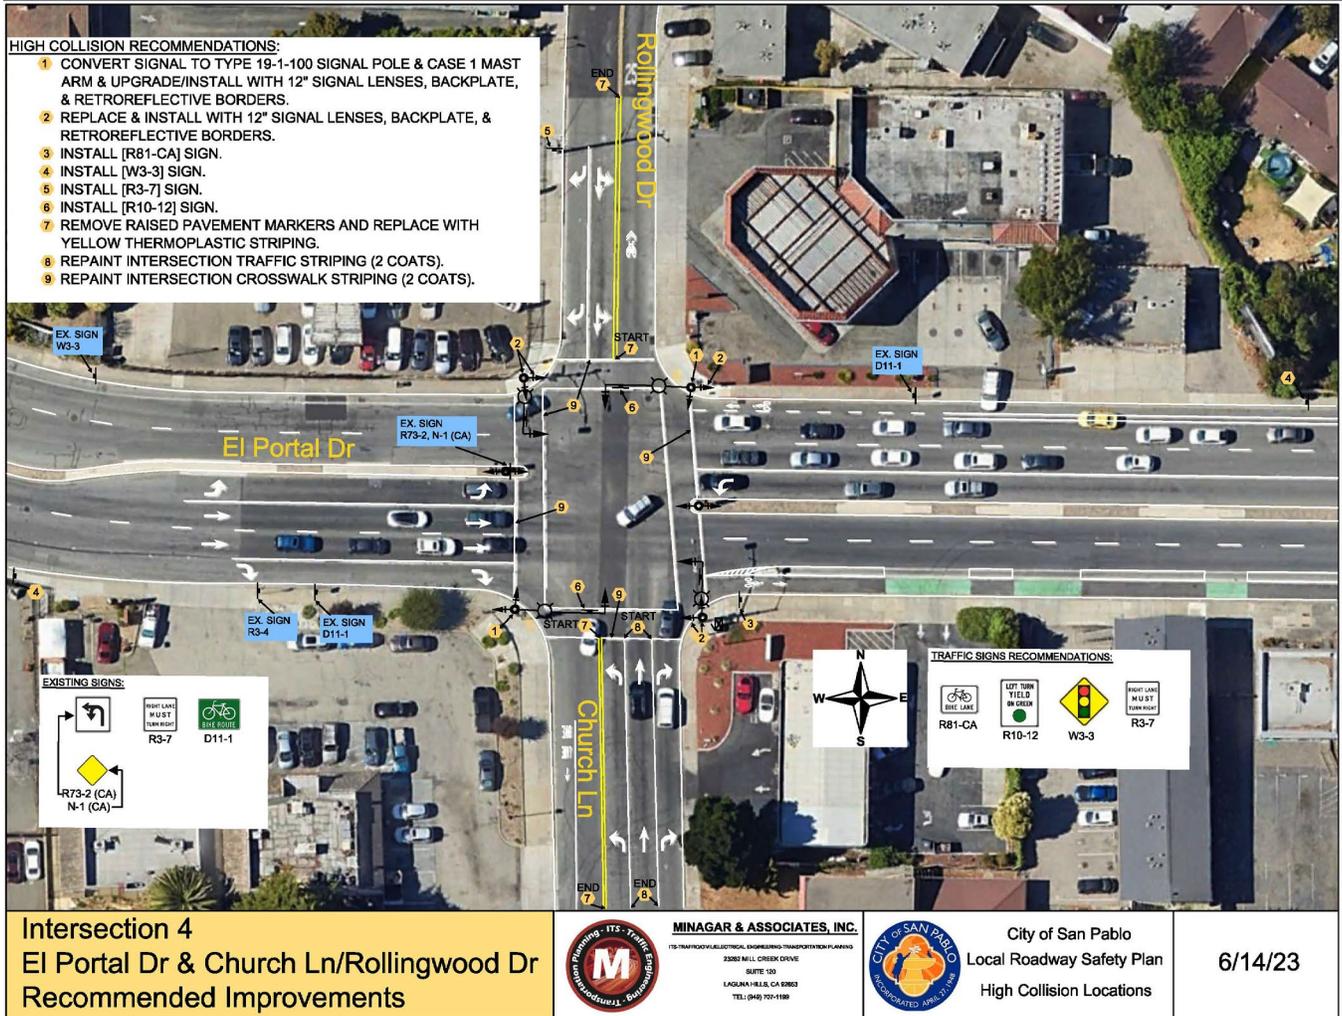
Intersection 4- El Portal Dr & Church Ln/Rollingwood Dr Recommended Improvements
